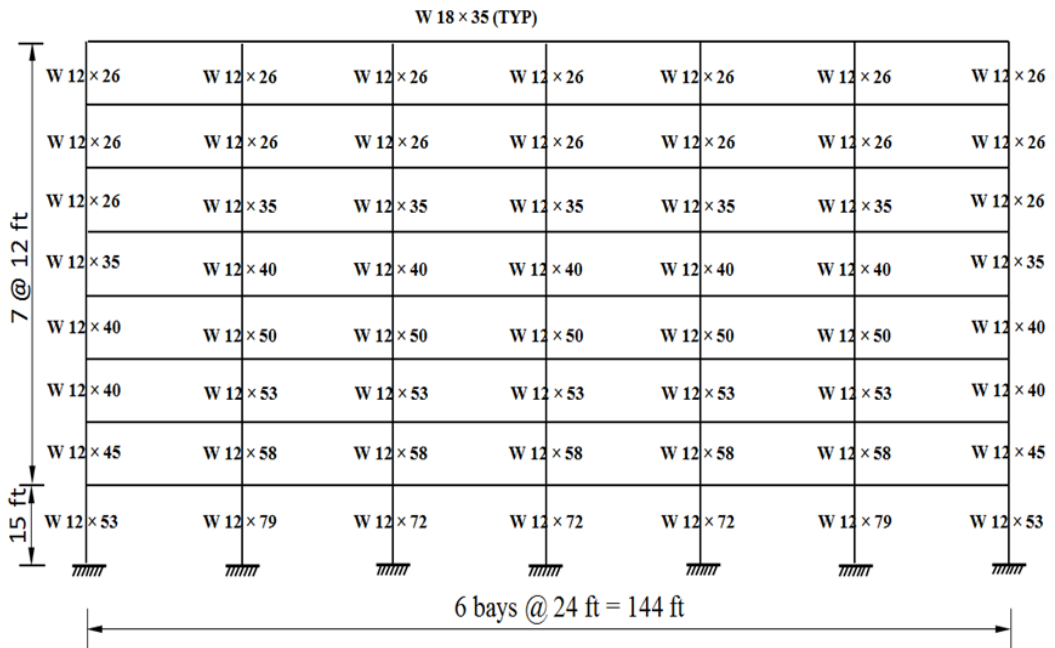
Elevation View of the Structure Located in Miami, FL
